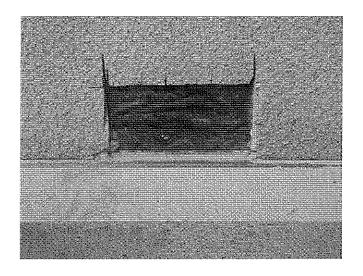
/ Rear elevation 1st floor windowsill and jamb.
